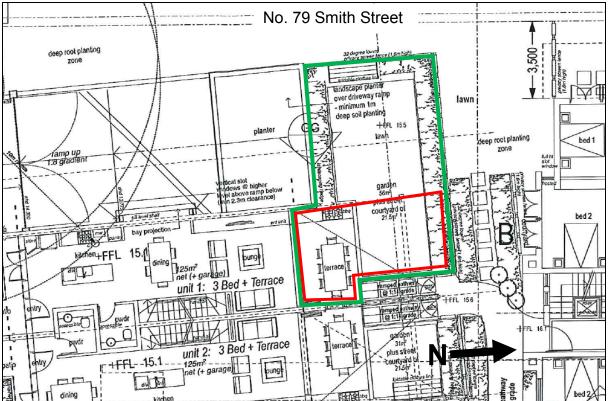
Private open space of Unit 1 Building A. Green line denotes open space, red line denotes 'principal private open space' in accordance with the definition in the DCP.
